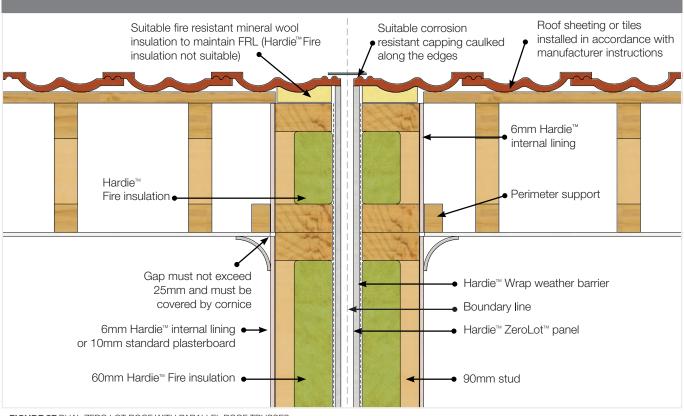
DUAL ZERO LOT ROOF WITH PARALLEL ROOF TRUSSES
